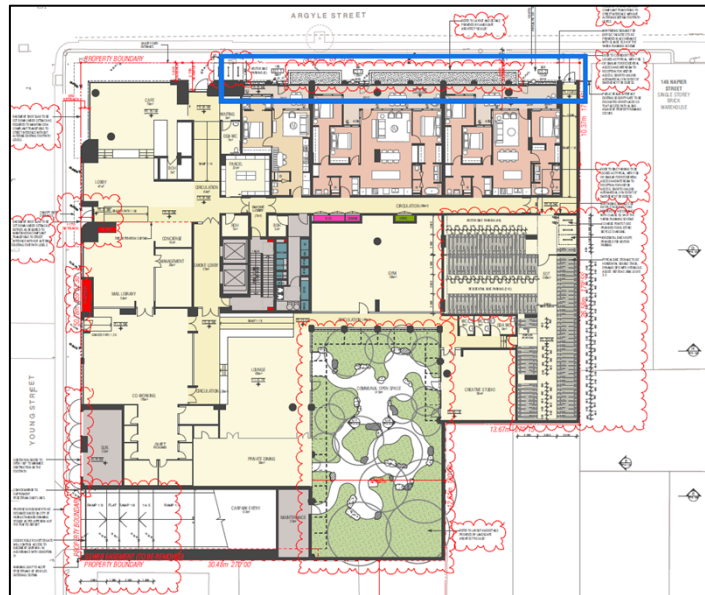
First S57A plans dated 10.03.2026 showing raised planters within the widened Argyle Street footpath outlined in blue (Source: FK Architects, dated 10.03.2026)
